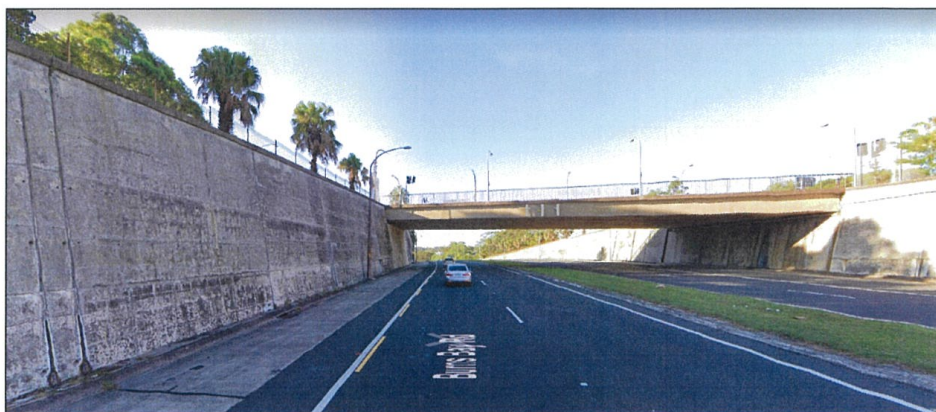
| Church Street overpass (southern elevation) from Burns Bay Road (view northbound)
